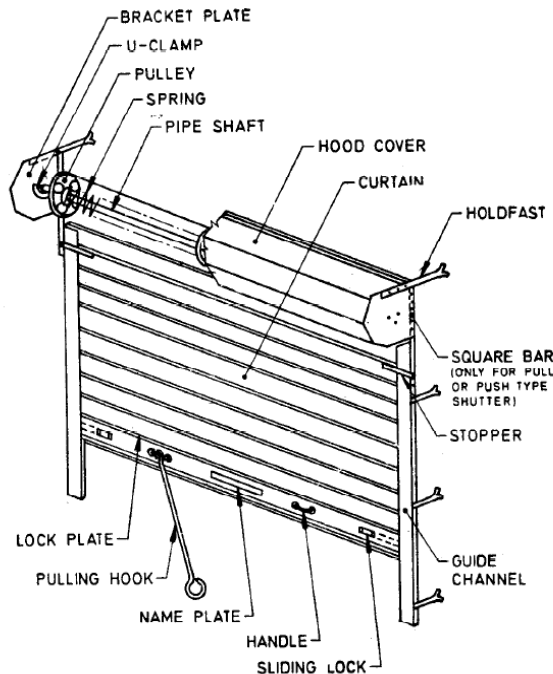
COMPONENT PARTS OF SELF-COILING ROLLING SHUTTER
